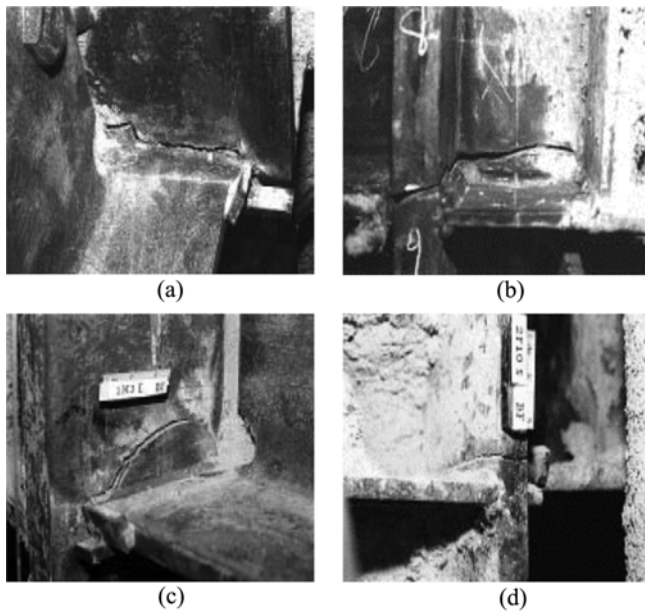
Welded Joint Failure Mode (FEMA-355D, 2000): (a) Fracture Occurred at Panel Zone, (b) Fracture Developed to the Column Web, (c) Fractures Developed to Column Flange, (d) Fracture Progresses into Column Web
